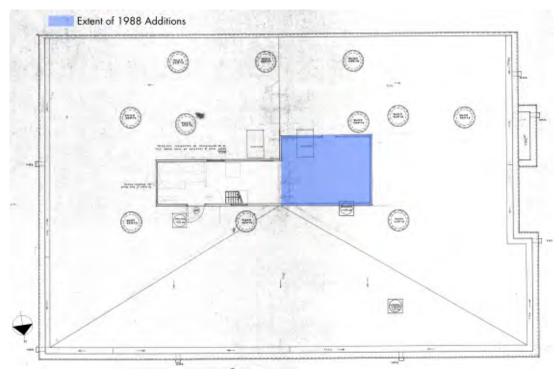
Surgical Block – Roof Plan (including 1988 Additions)
